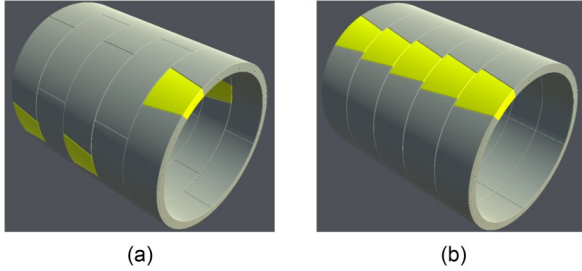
Schematic diagram of two assembly methods: (a) staggered-joint assembly; (b) continuous-joint assembly
